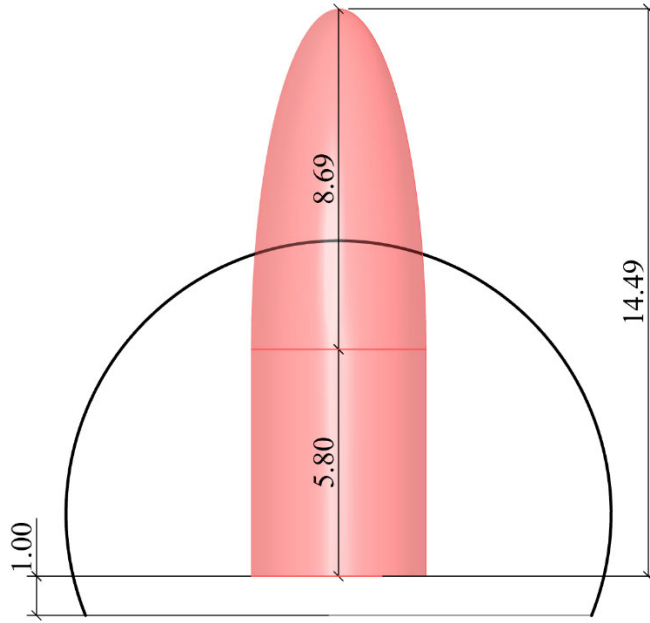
Dimesioned free flame in tunnel cross section (*m*)
